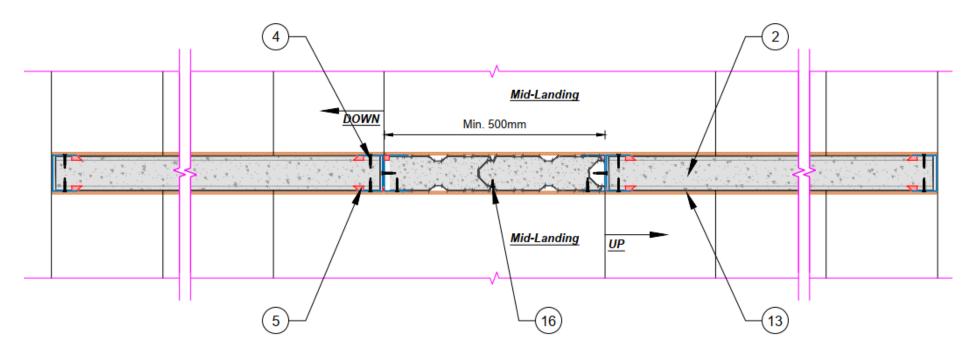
Dual wall system with vertical wall between horizontal walls - plan view
